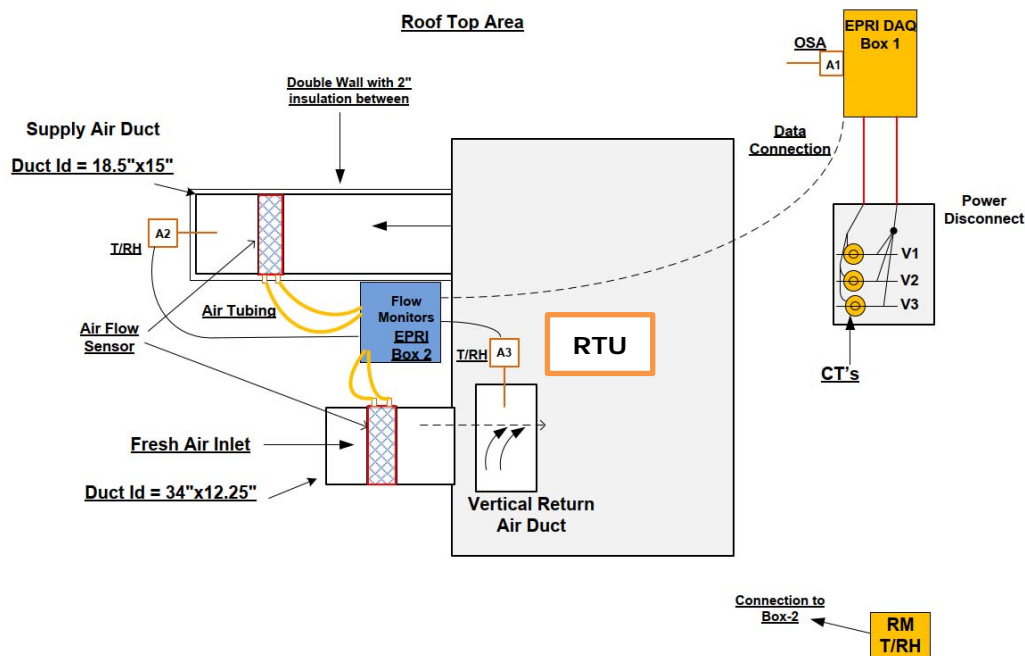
SITE 2 INSTRUMENTATION LAYOUT
